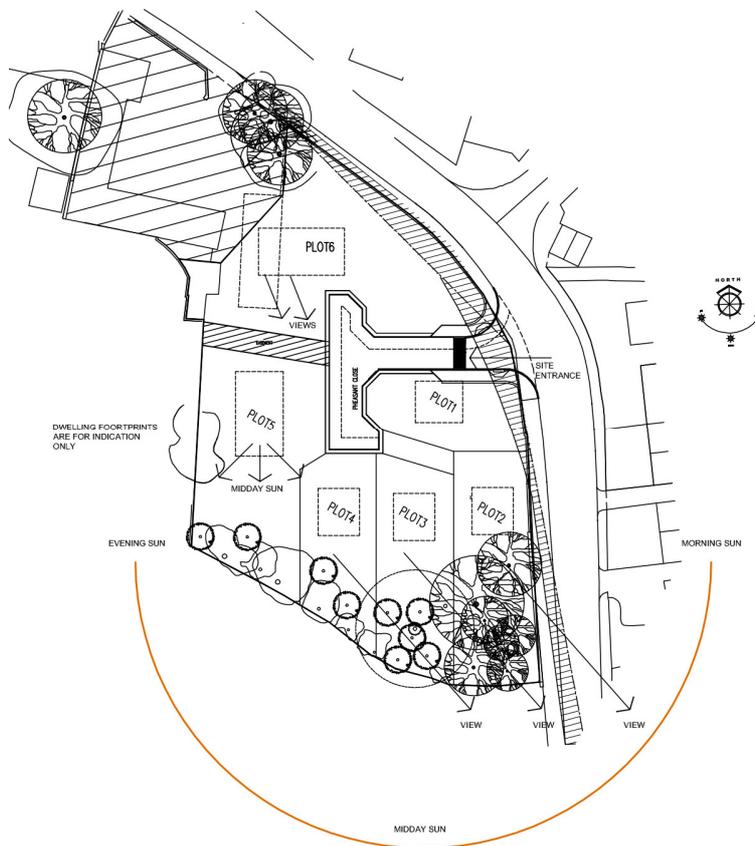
| Proposed site plan Delf Garth | Dwelling footprints indication only
